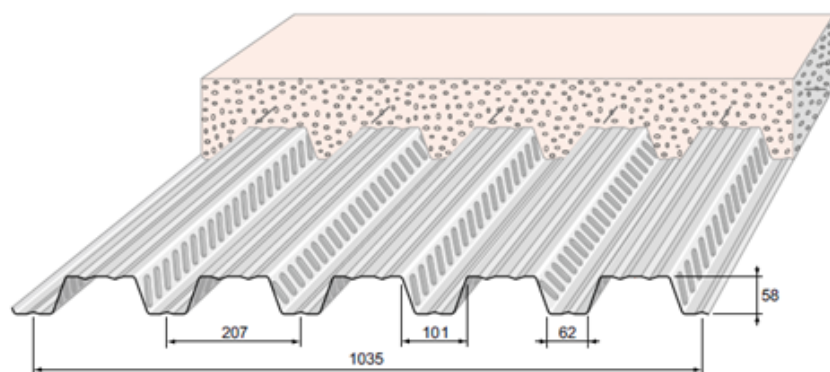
Trapezoidal steel deck in composite floor slab [19]
